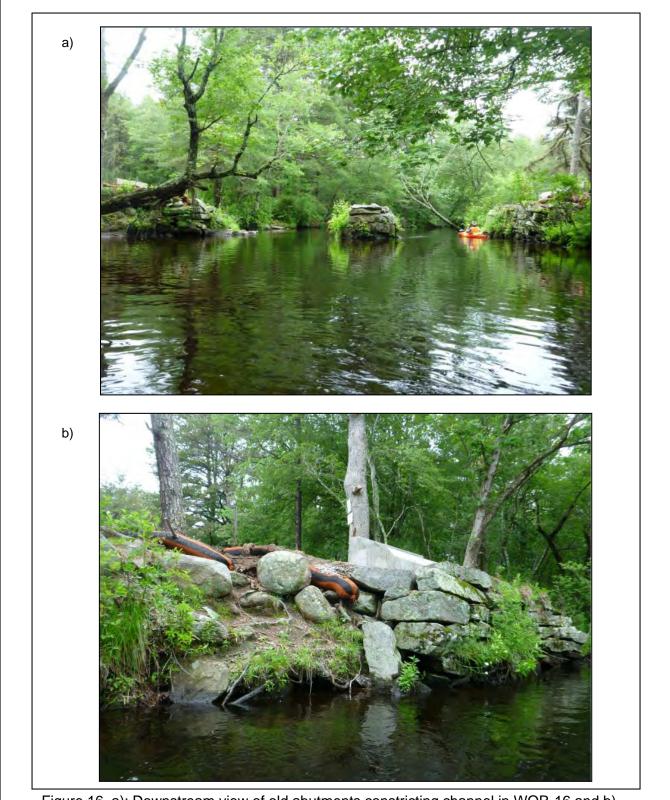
a): Downstream view of old abutments constricting channel in WOR-16 and b) right bank view of bank erosion due to abutments.
